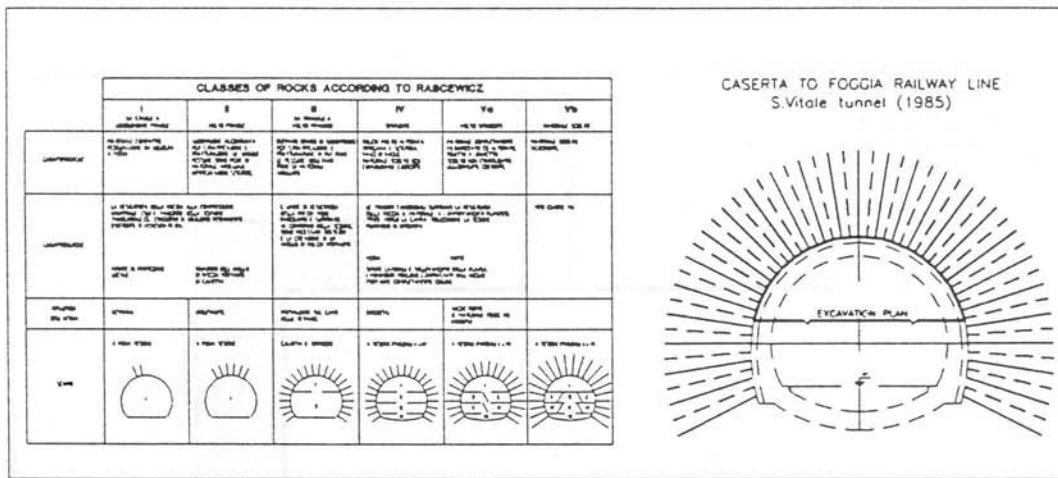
San Vitale Tunnel: partial face excavation by NATM
